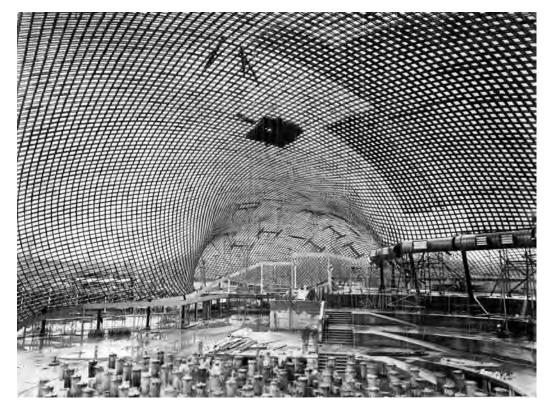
Mannheim Multihalle construction site with real load test. (Photo Frei Otto 1975)
